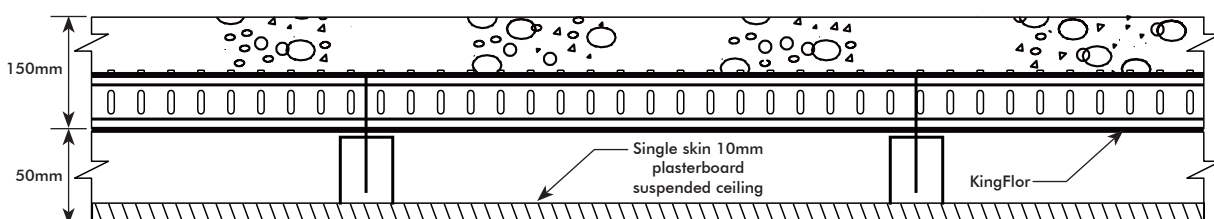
A Shallow Composite Floor - Bare Concrete Slab with Plasterboard Ceiling
